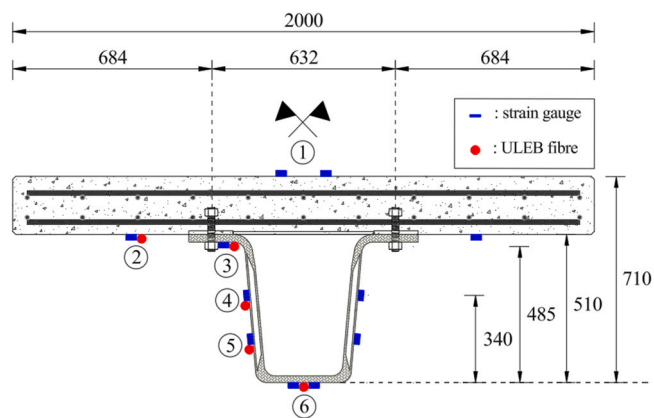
Details of the instrumentation at the mid-span of the FRP-concrete composite bridge deck specimen (units: mm).
